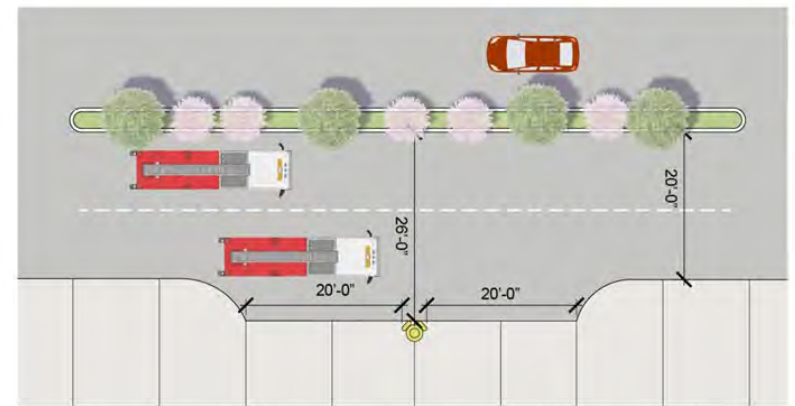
FIRE ACCESS UNOBSTRUCTED WIDTH OF 26 FT ADJACENT TO FIRE HYDRANT
